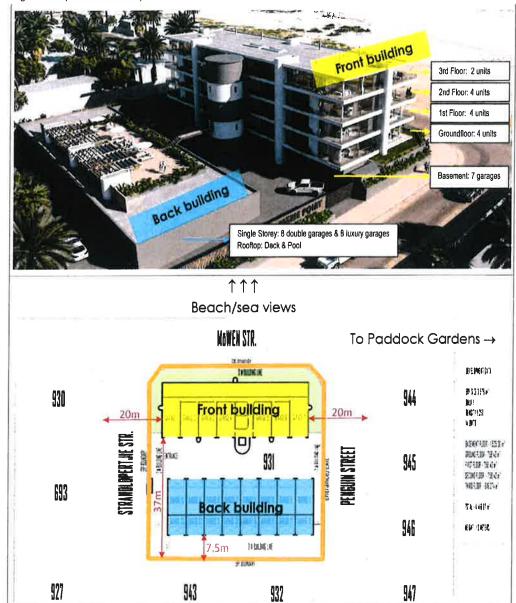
Proposed Site Development Plan for Erf 931 Vineta Extension 4.
